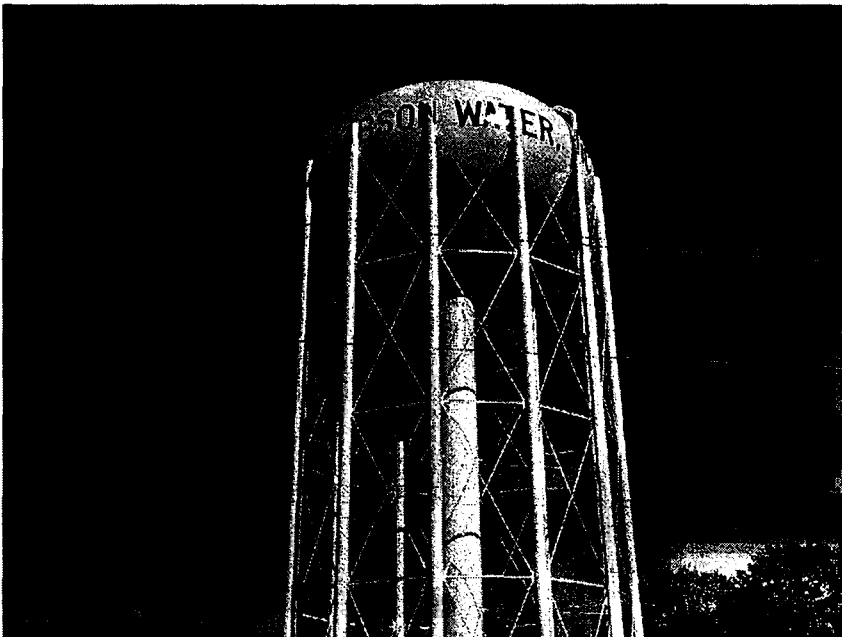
1,500,000 gal. Elevated Tank located on County Road 100E, east of Toyota Manufacturing
